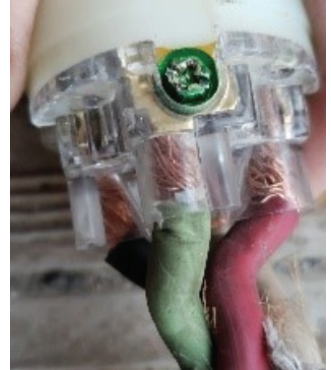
IMAGE G – IMPROPER GAUGE WIRE FOR 30 AMP PLUG
